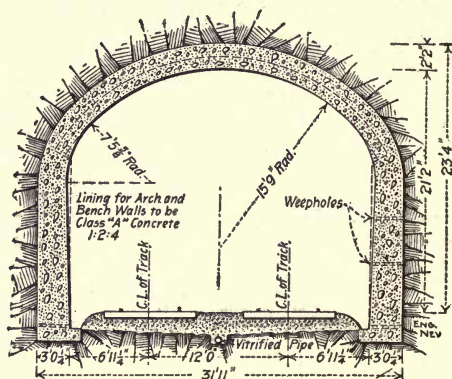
Peekskill Tunnel: Concrete Lining.
